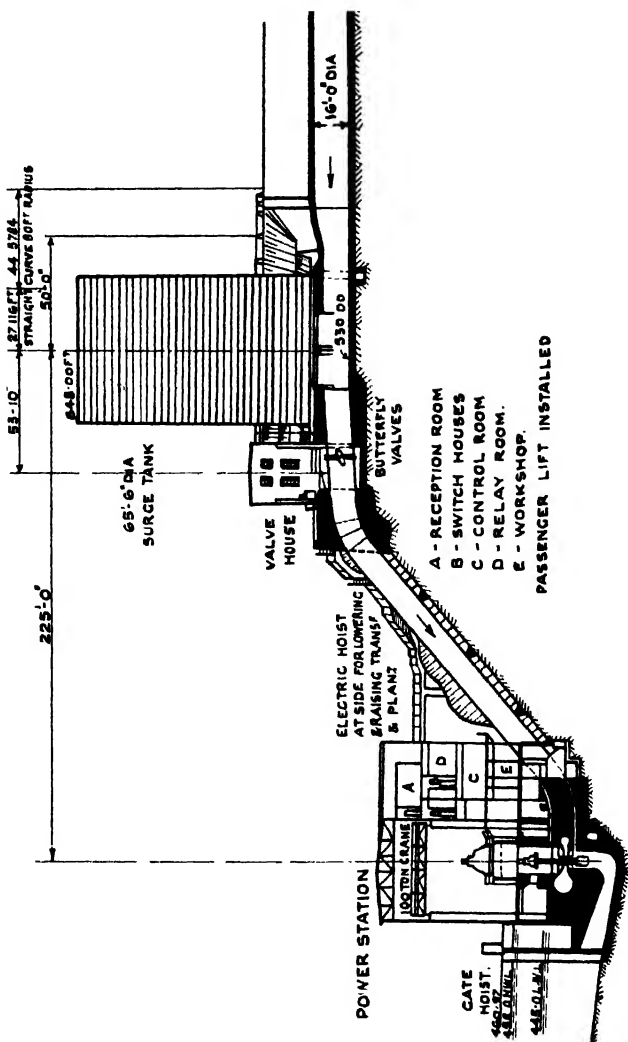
Layout of 30 MW Station. (2-15 MW Kaplan Turbines.)
